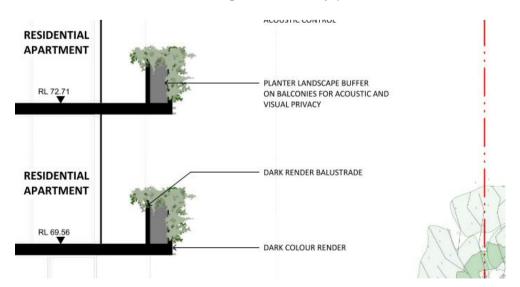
Cross section through balconies/planter boxes (Tower A).
